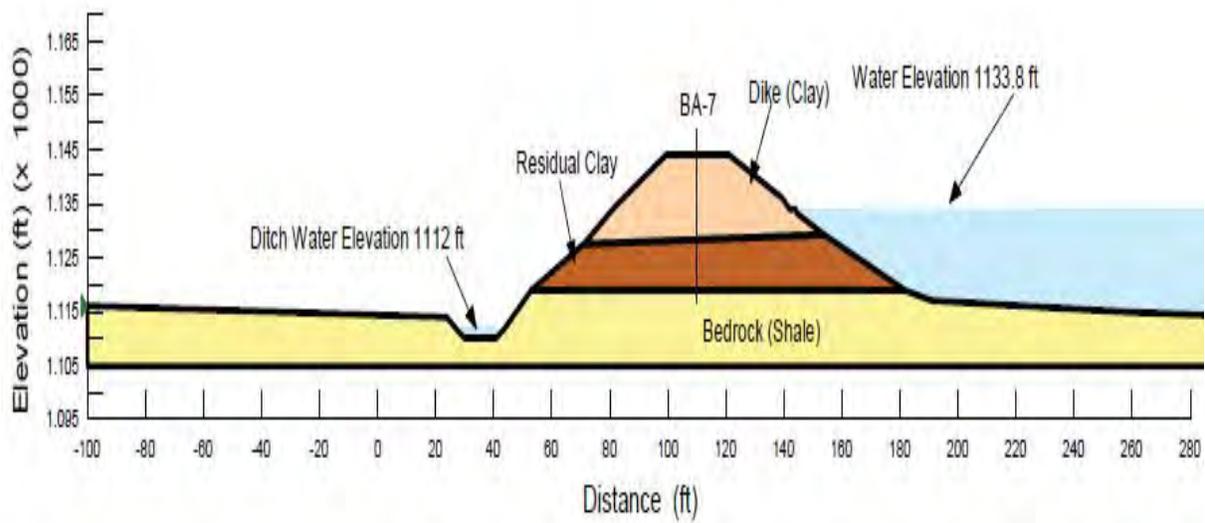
Typical Bottom Ash Disposal Area 2 Cross Section
